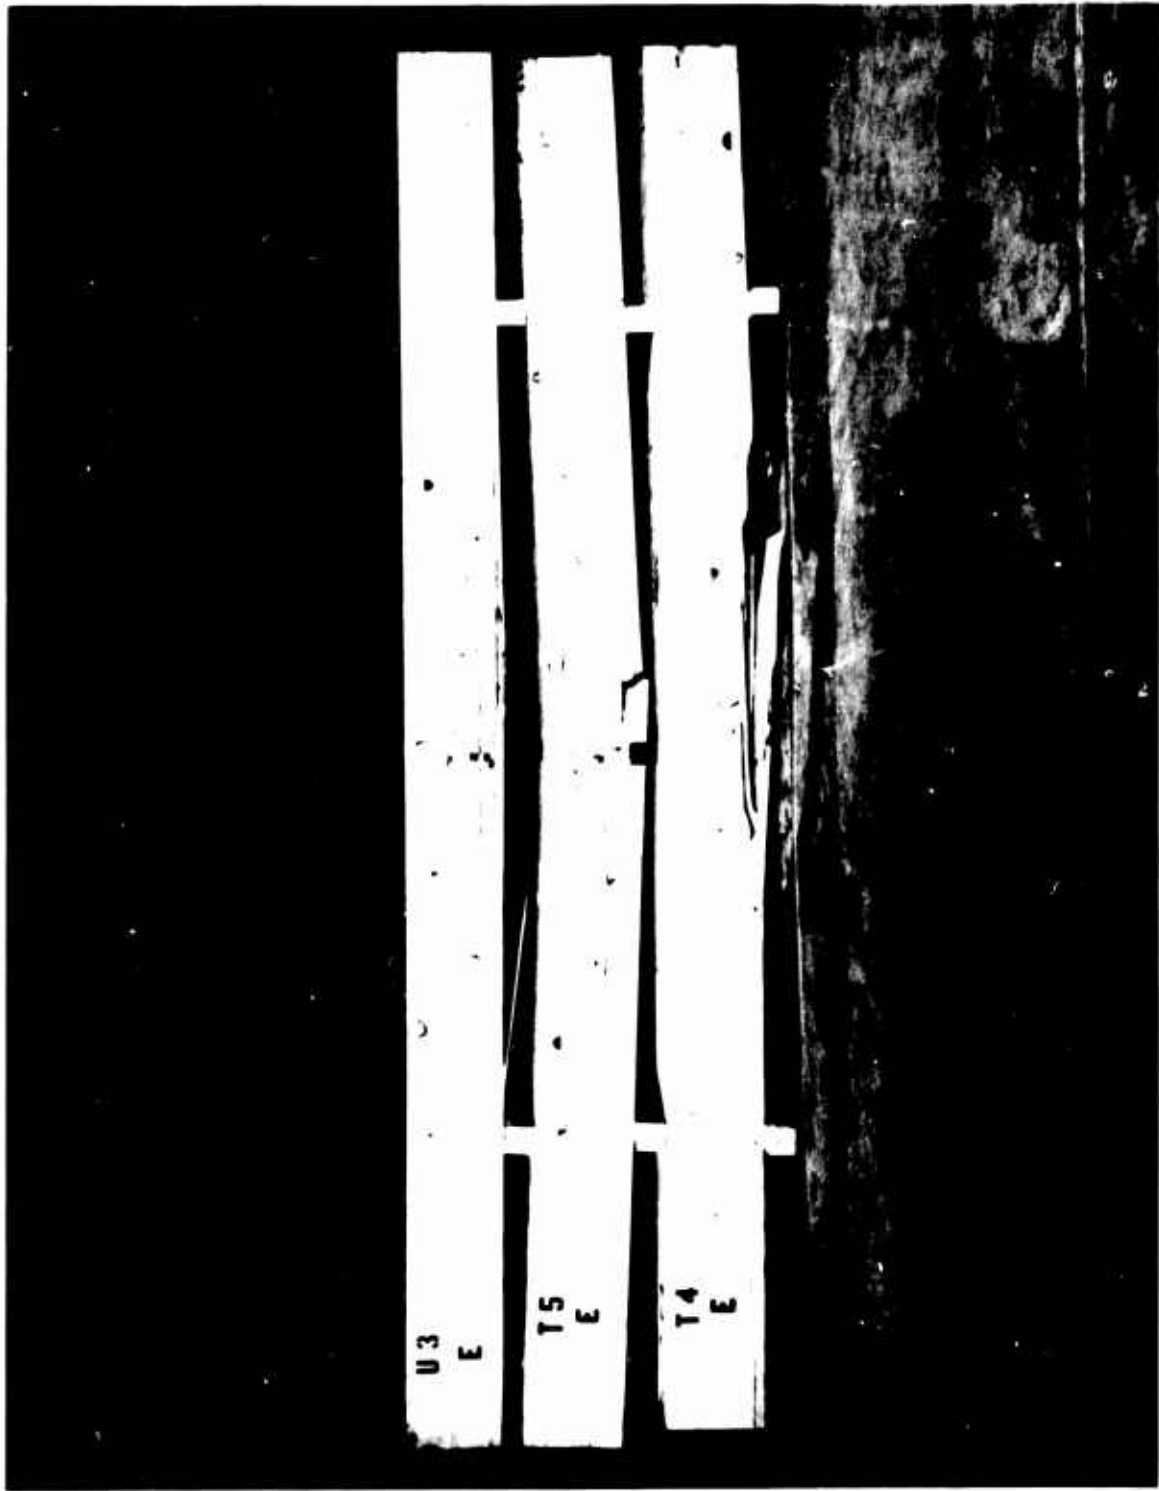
Post shot view of beams T4, T5, and U3. (U3 was loaded statically.)
